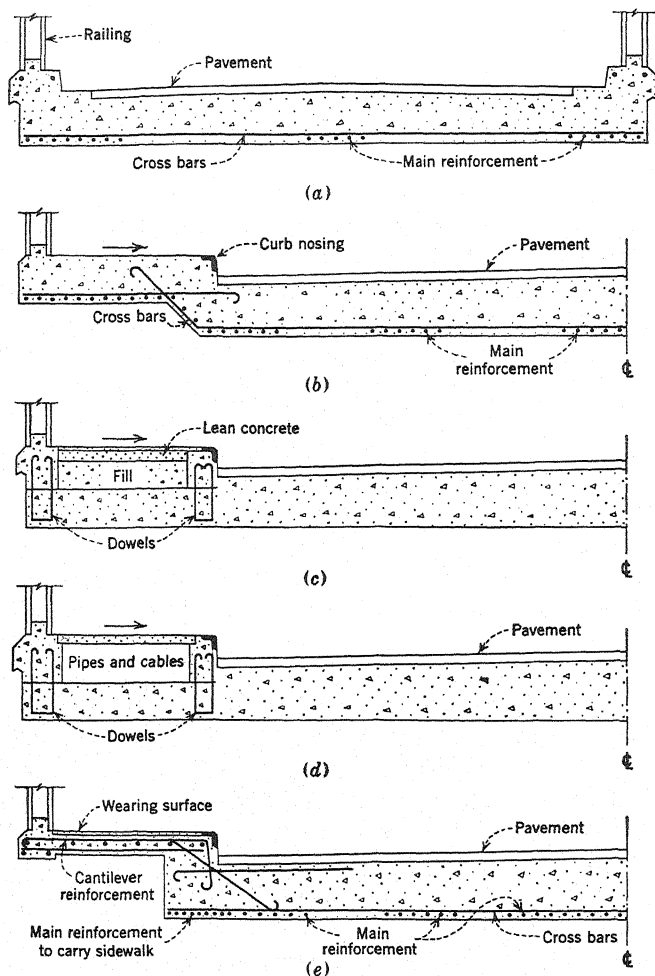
Typical Cross Sections of Slab Bridges. (See p. 30.)
